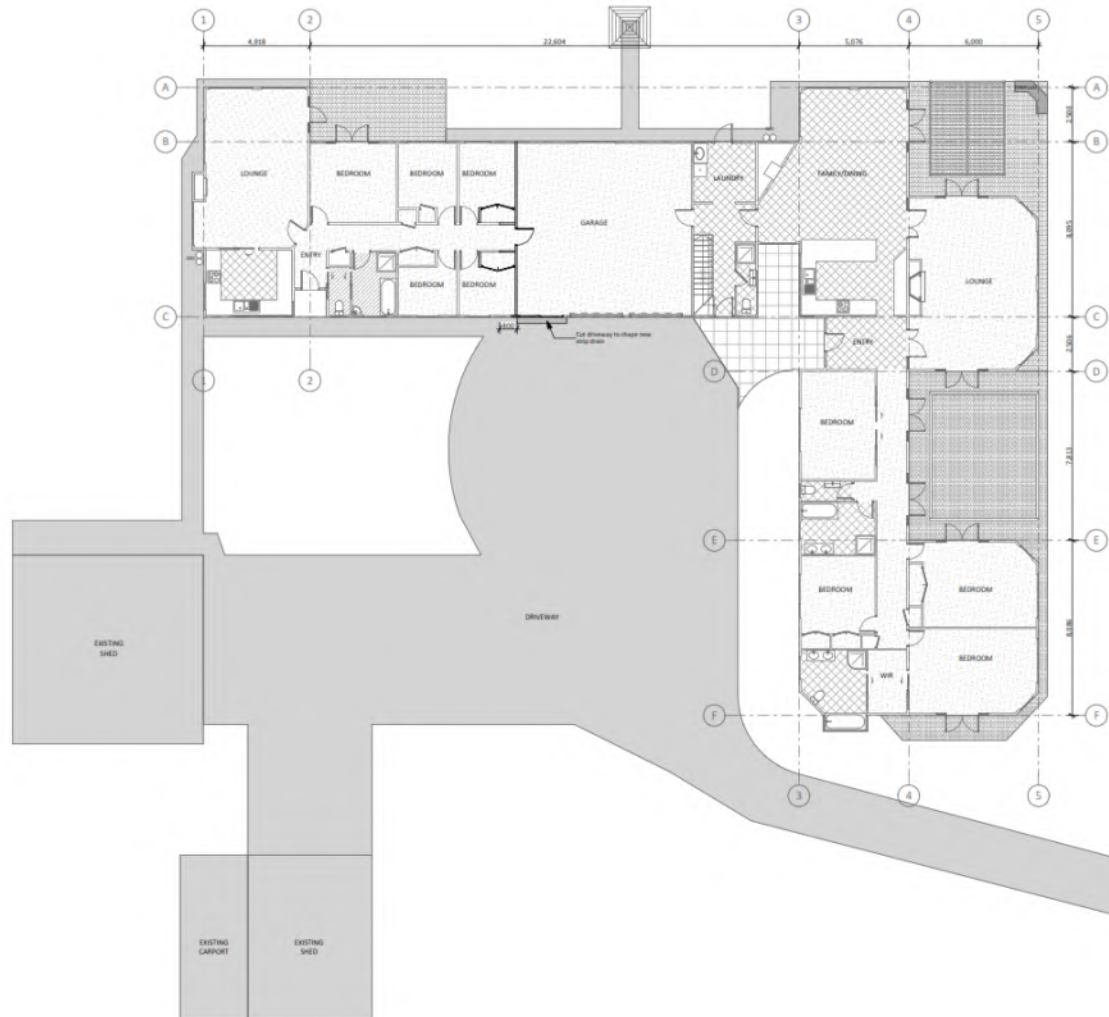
Proposed Floor Plan (Cato Bolam 48373-DR-RC202, date 22/01/2025)
